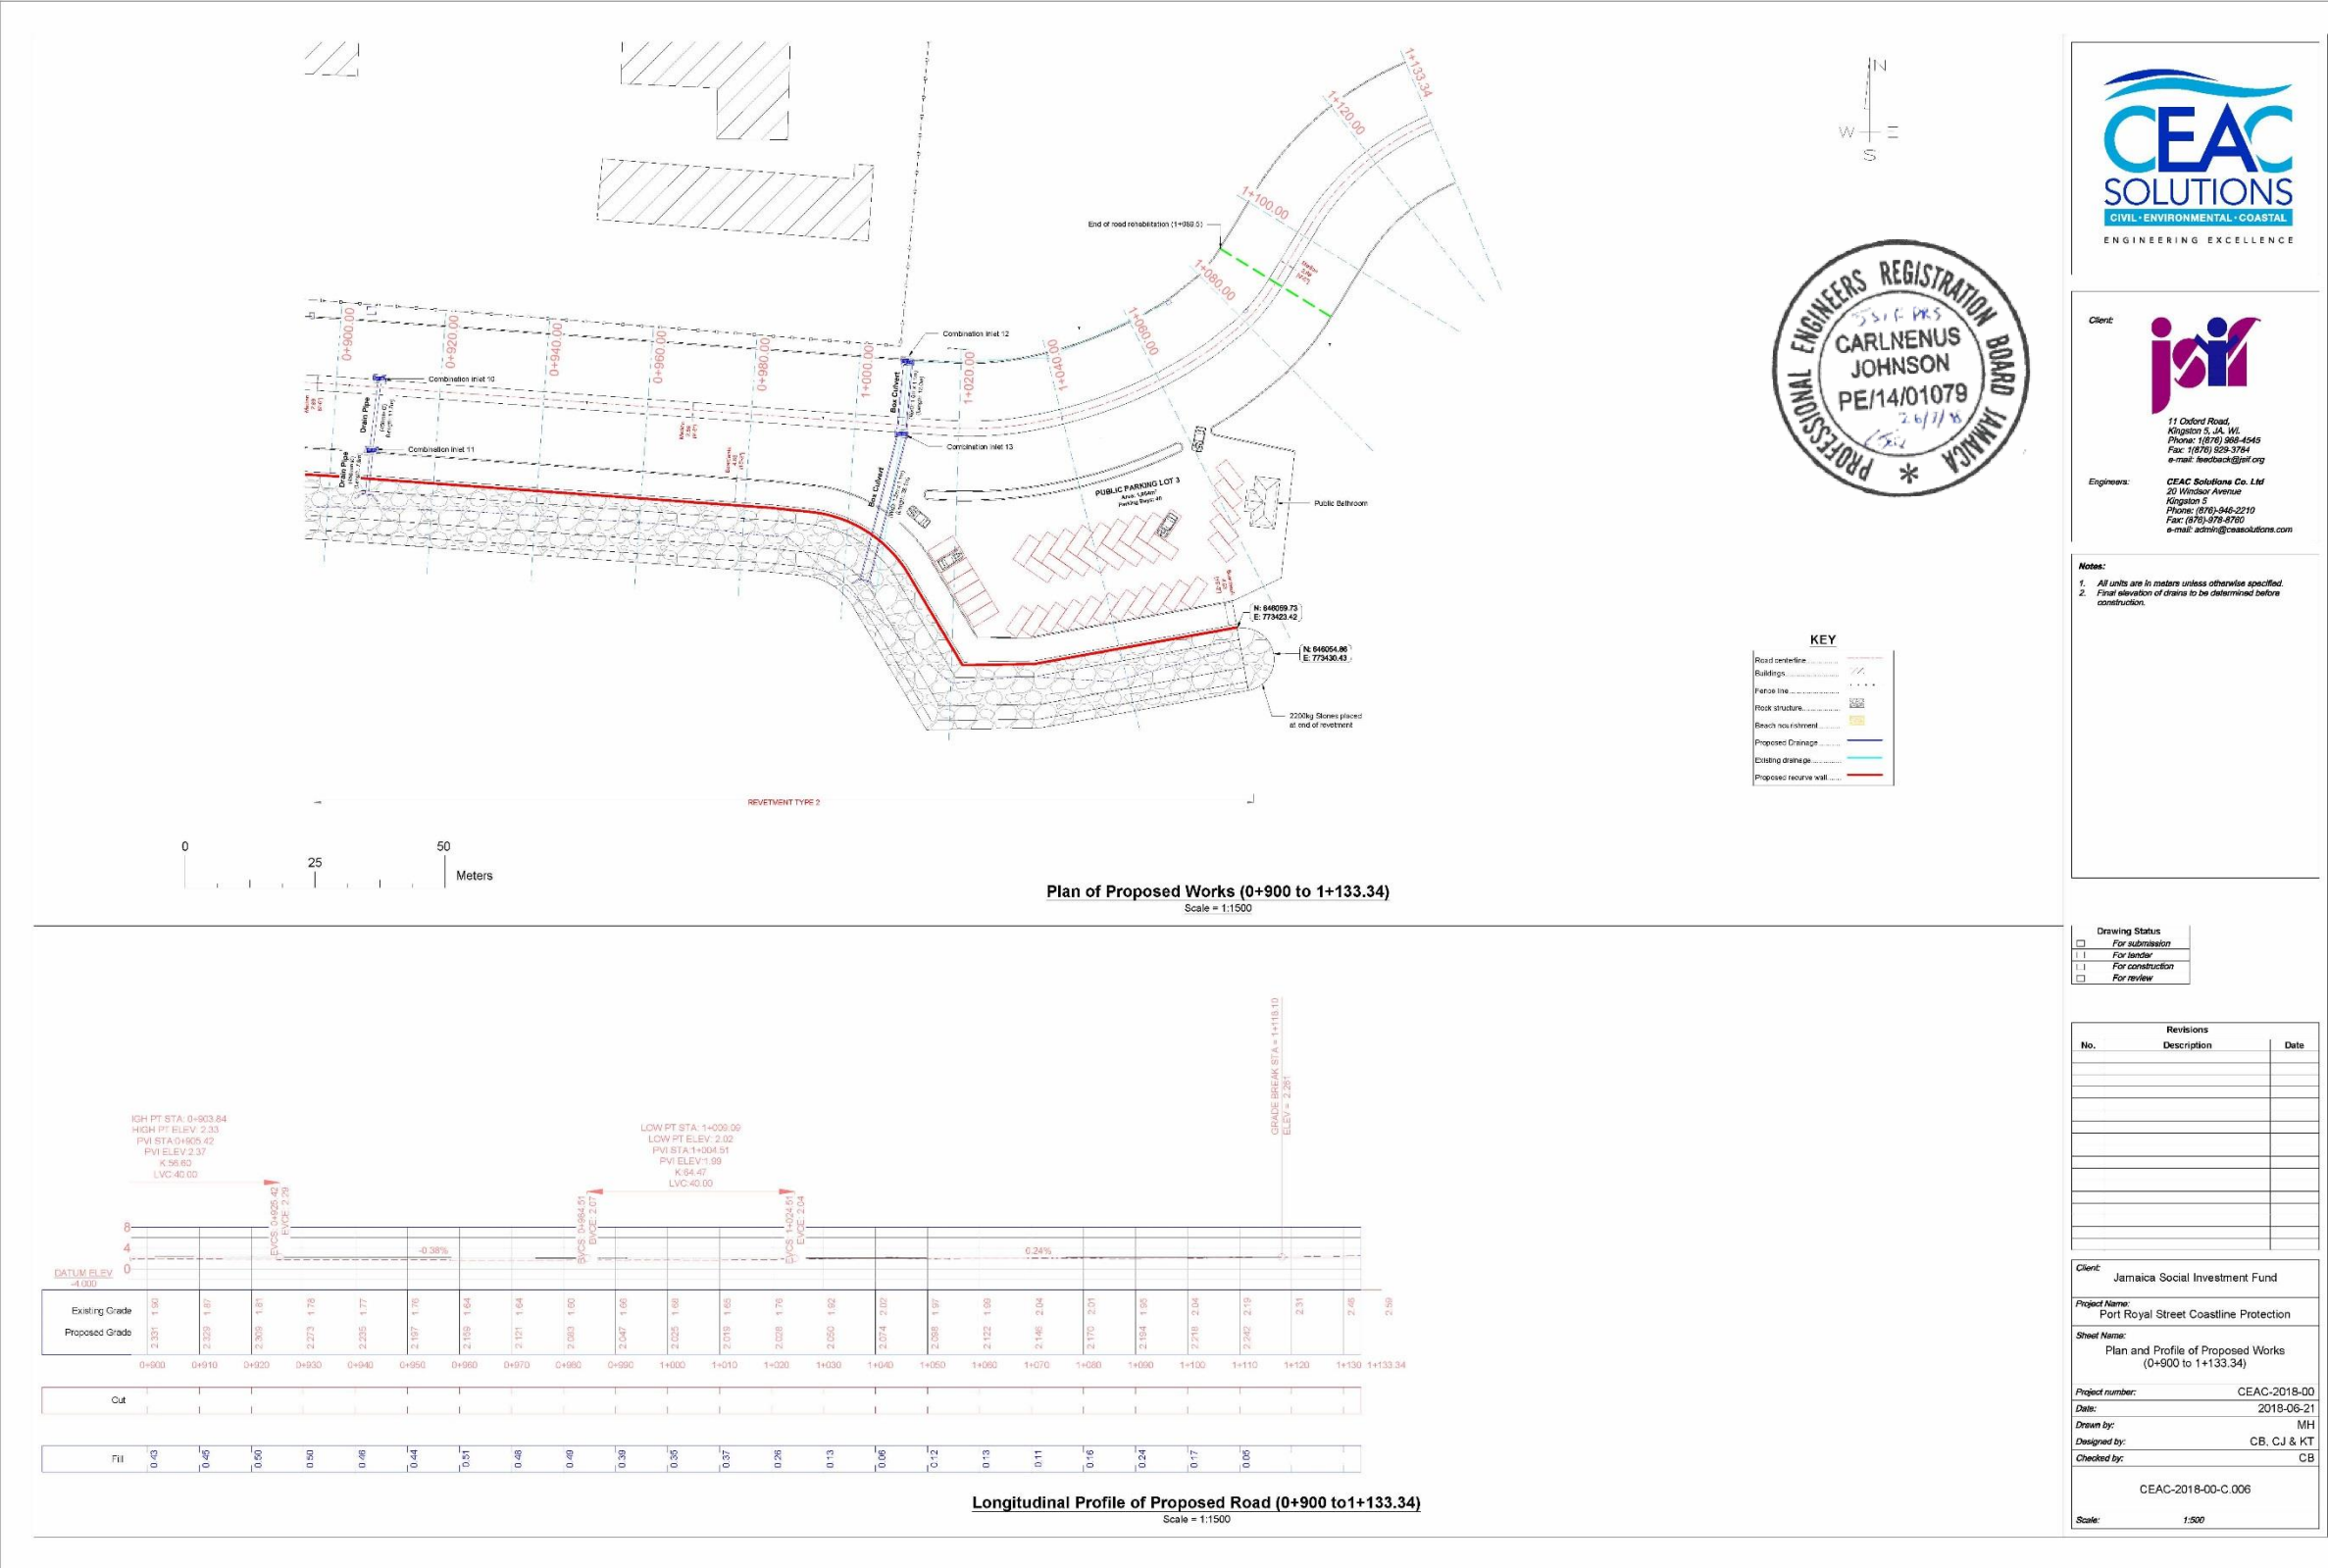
Plan and Profile of Proposed Works (0+900 to 1+133.34)
